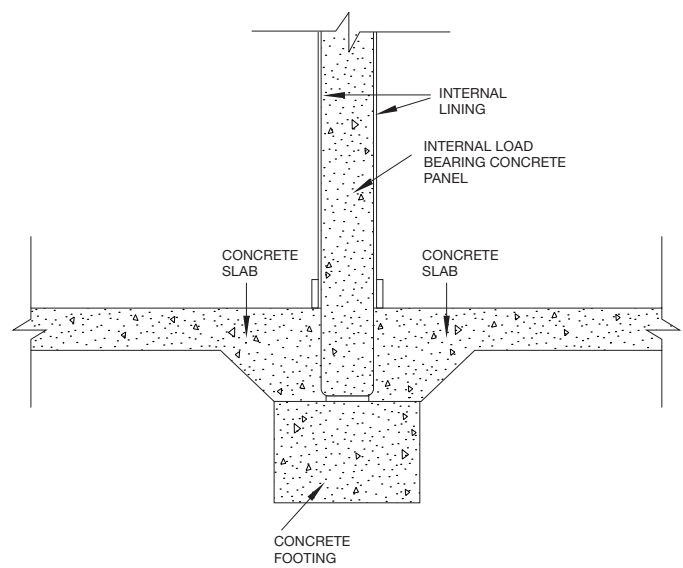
Internal Load Bearing Base Connection. (Laterally restrained by floor slabs cast after installation of wall panel)
